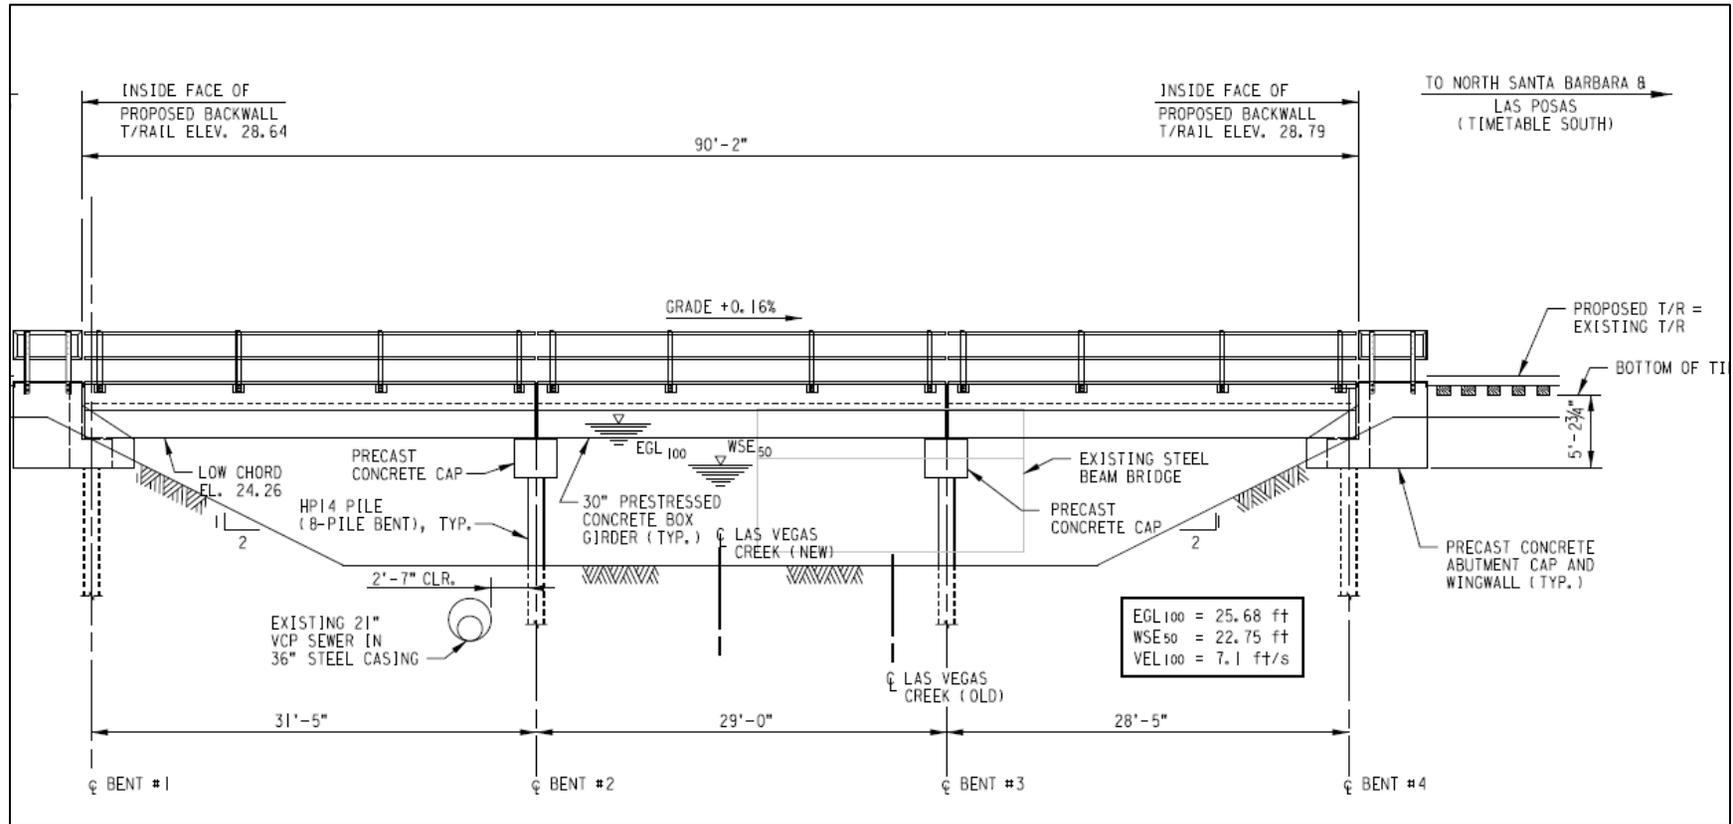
UPRR Bridge Project - Las Vegas Creek, Detail
